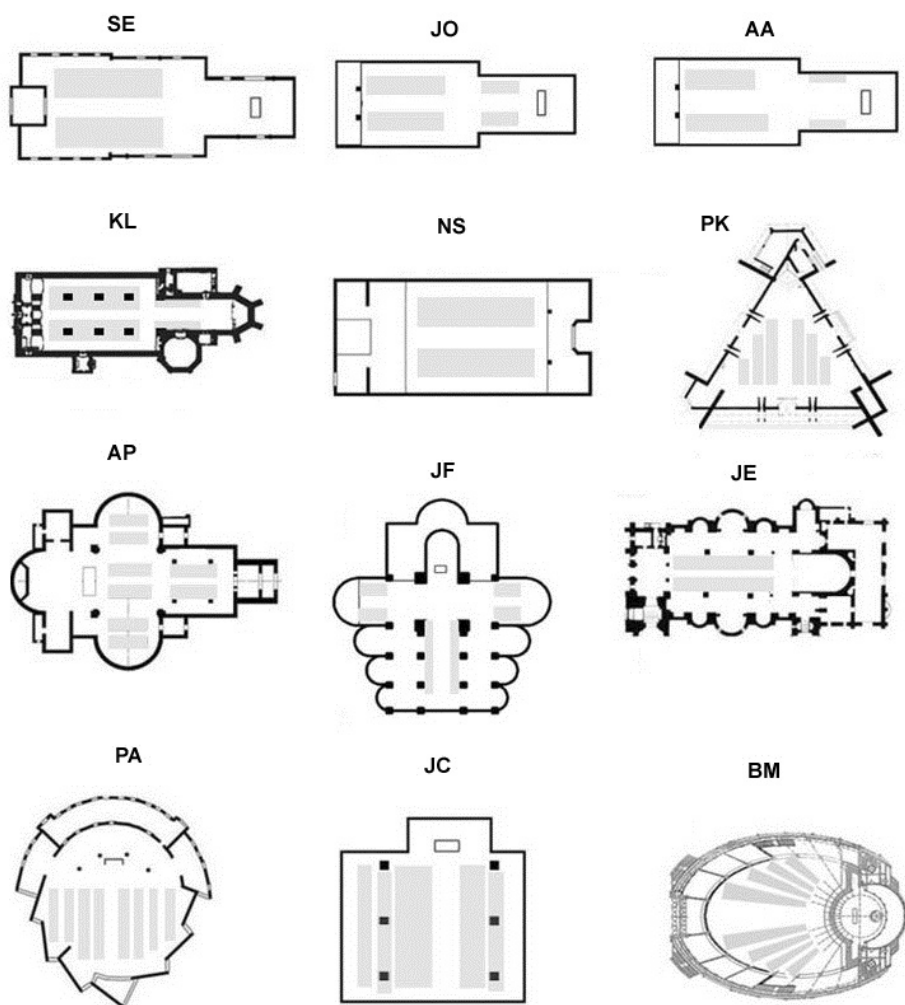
Ground plan with pew zone (shaded area) for the 12 churches surveyed
